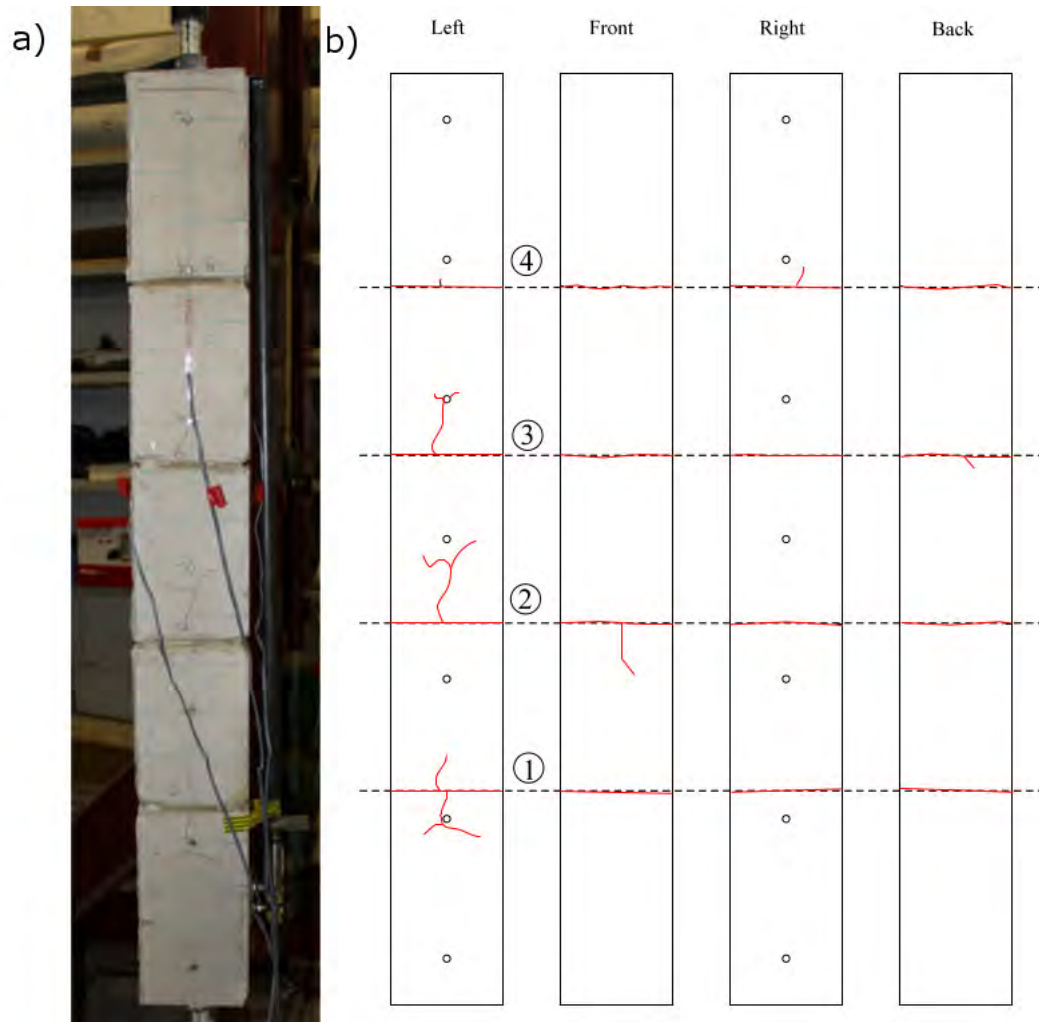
C3F16n: a) specimen during testing b) crack pattern.
